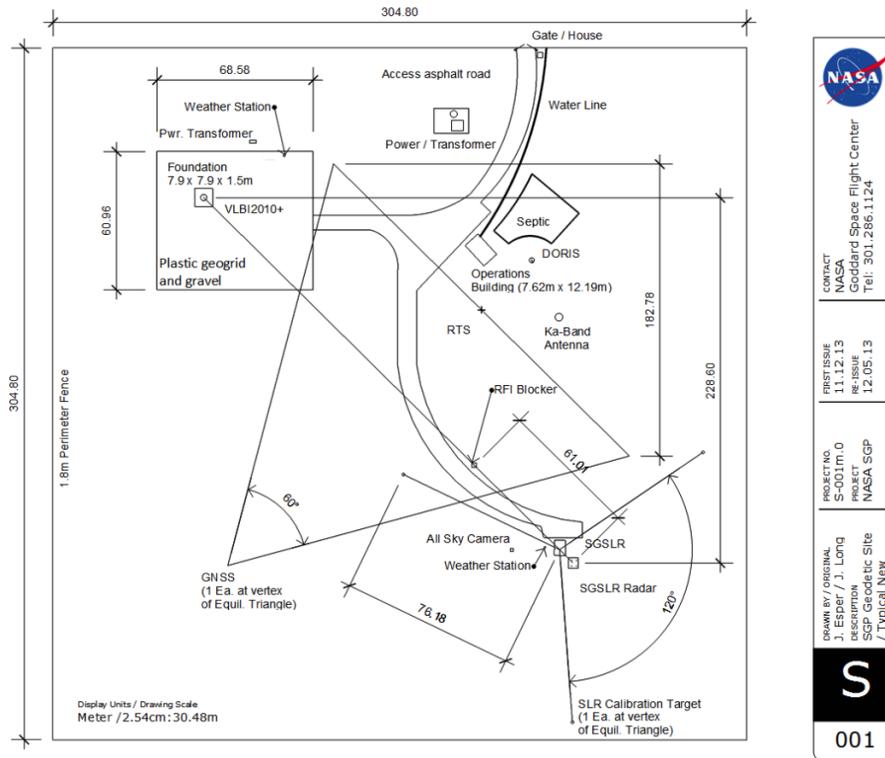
Notional Site Layout in the NASA Space Geodesy Project Plan highlighting the RF Site Blocking Scheme (Provided by Jaime Esper/NASA)
